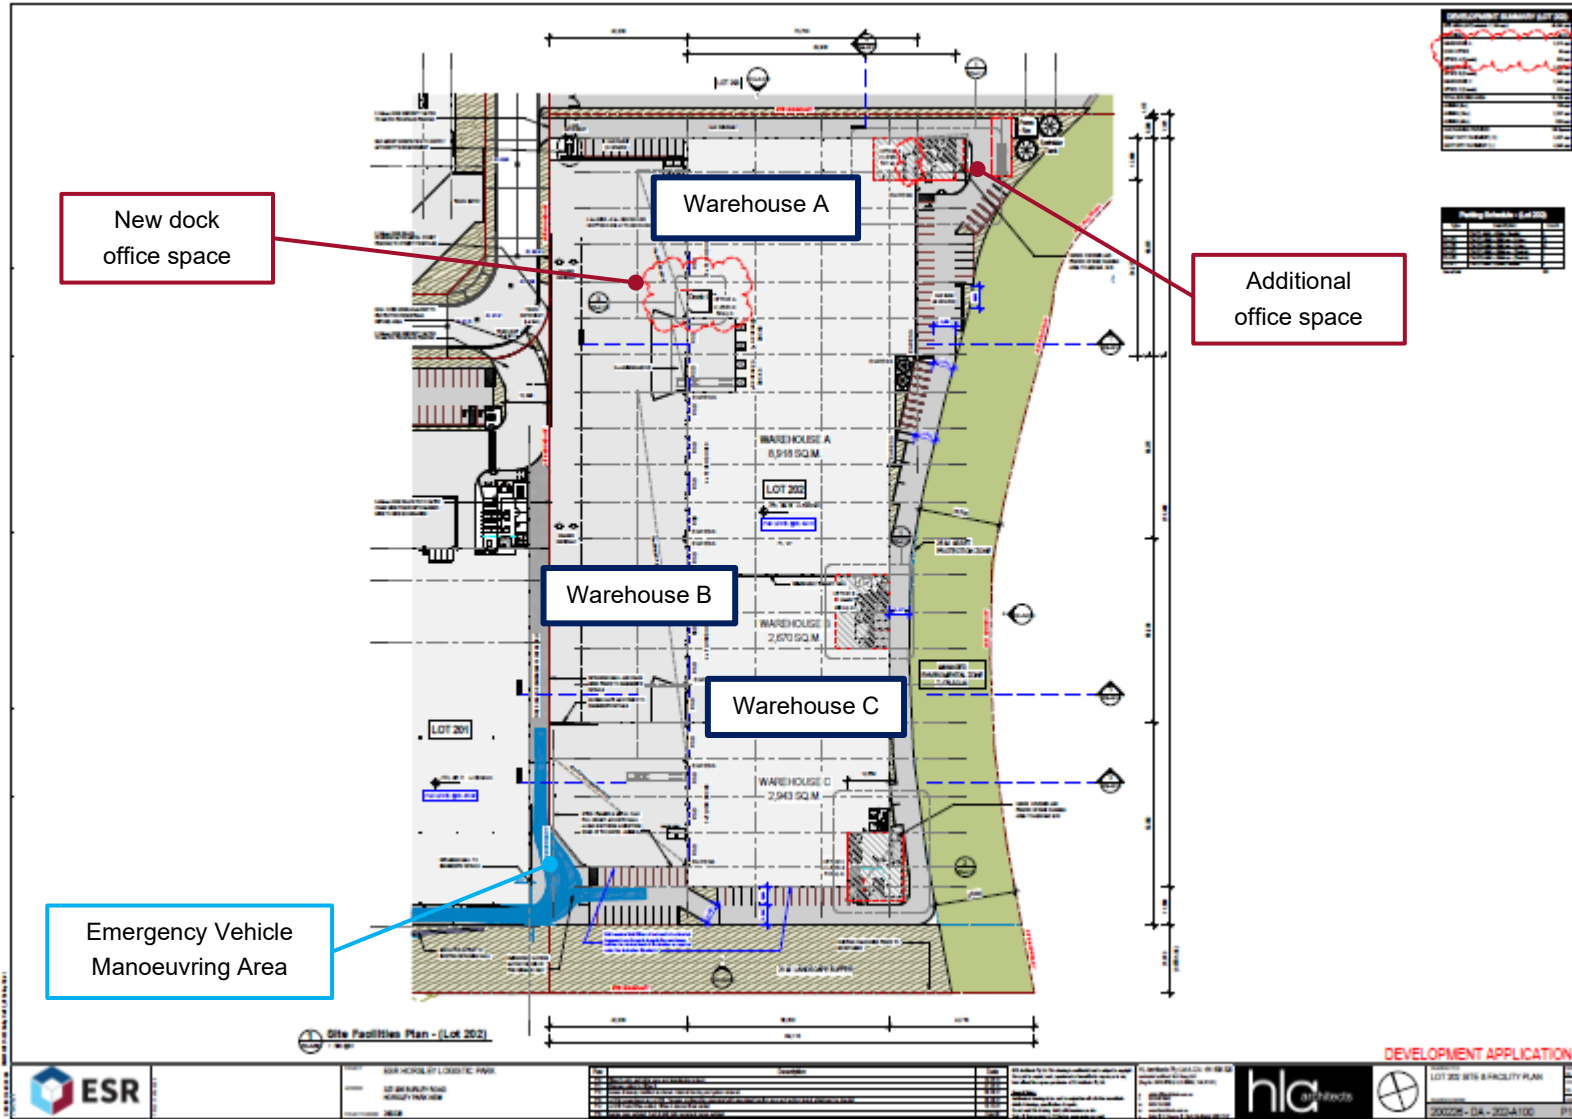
| Proposed Lot 202 Warehouse (previously Lot 204)
